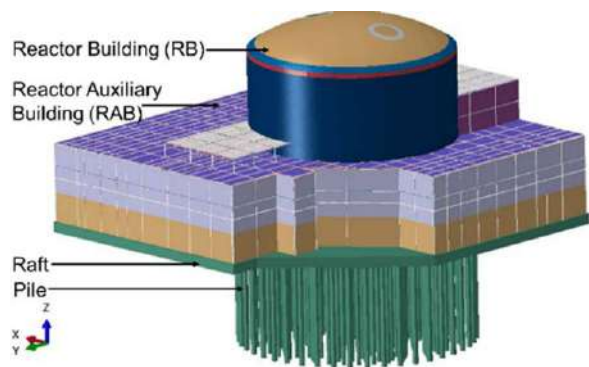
Finite Element model of a typical nuclear building supported on combined pile-raft foundation (Choudhury, 2026)
